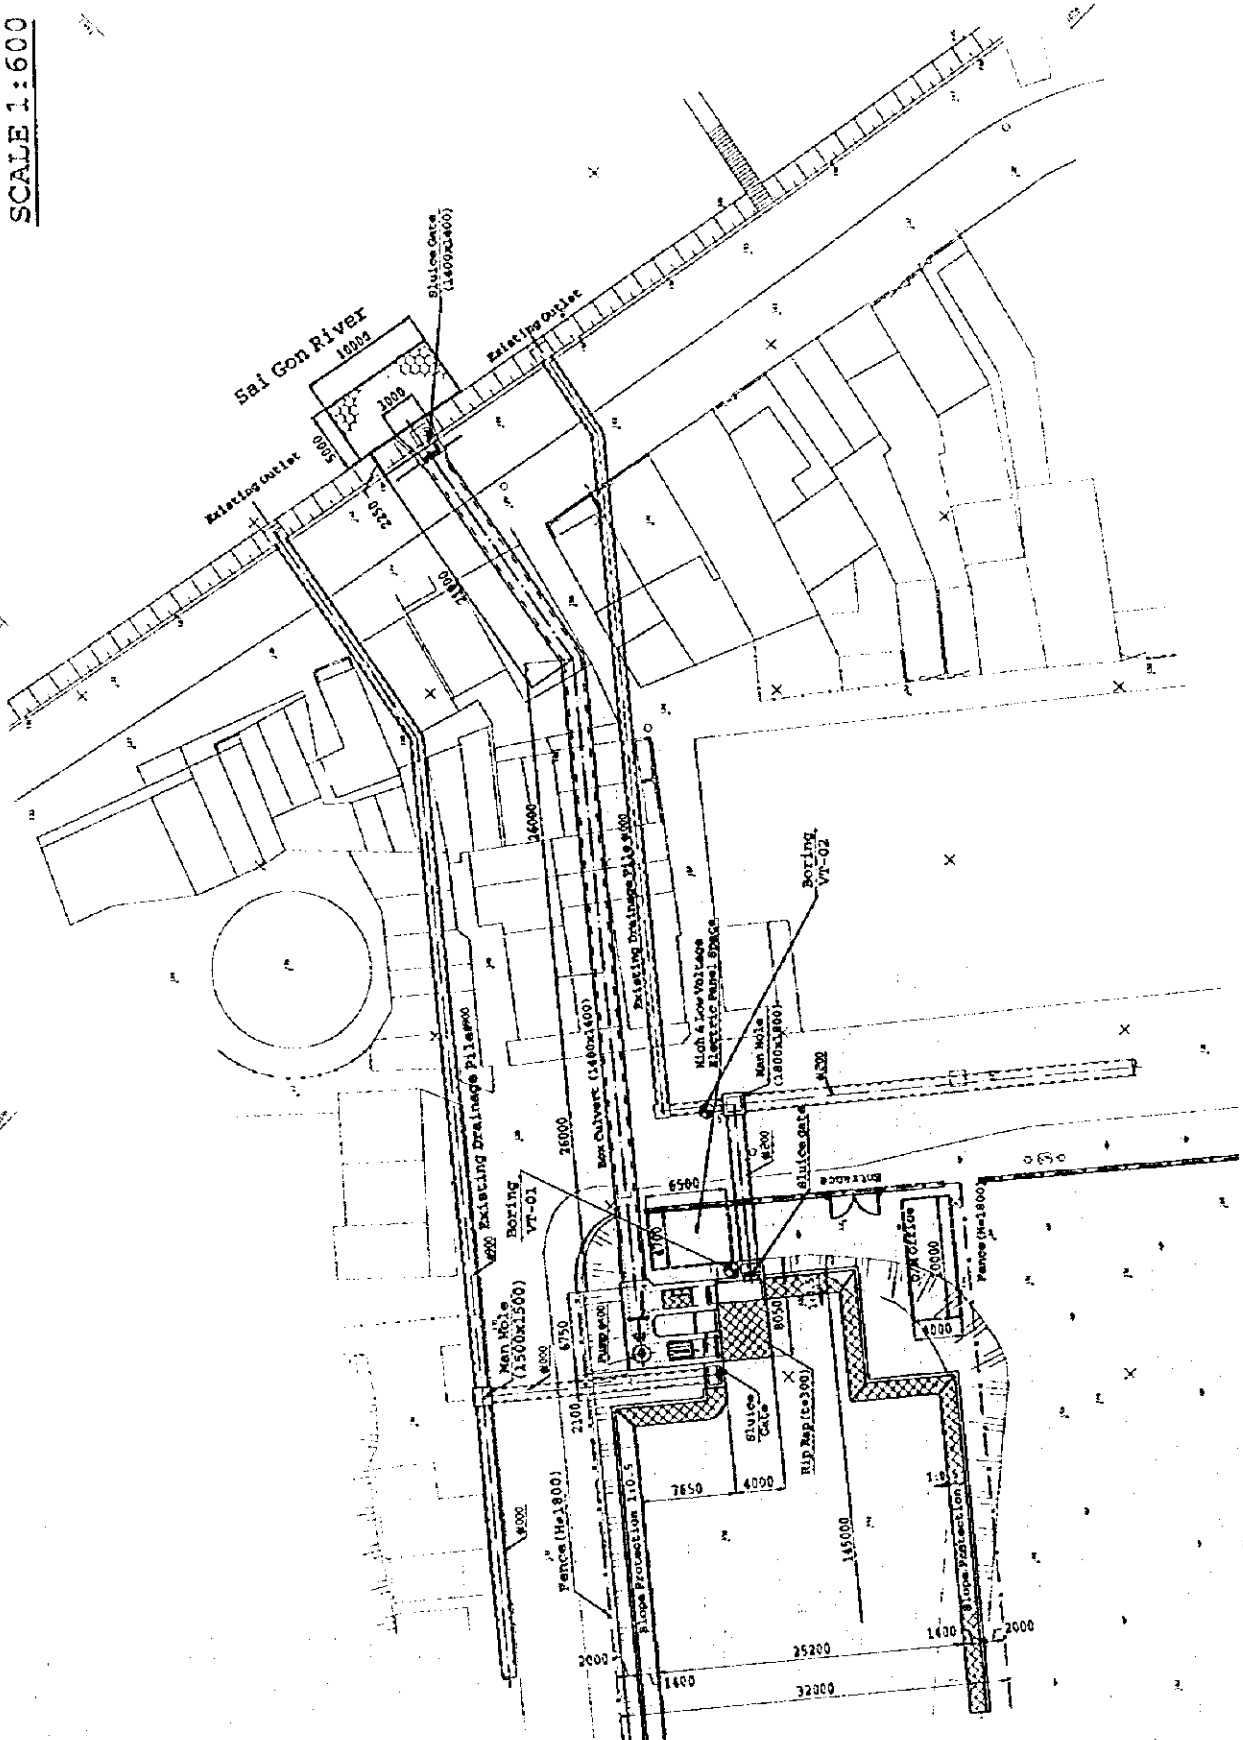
(1/4) LAYOUT OF PROPOSED THANH DA PUMPING STATION
